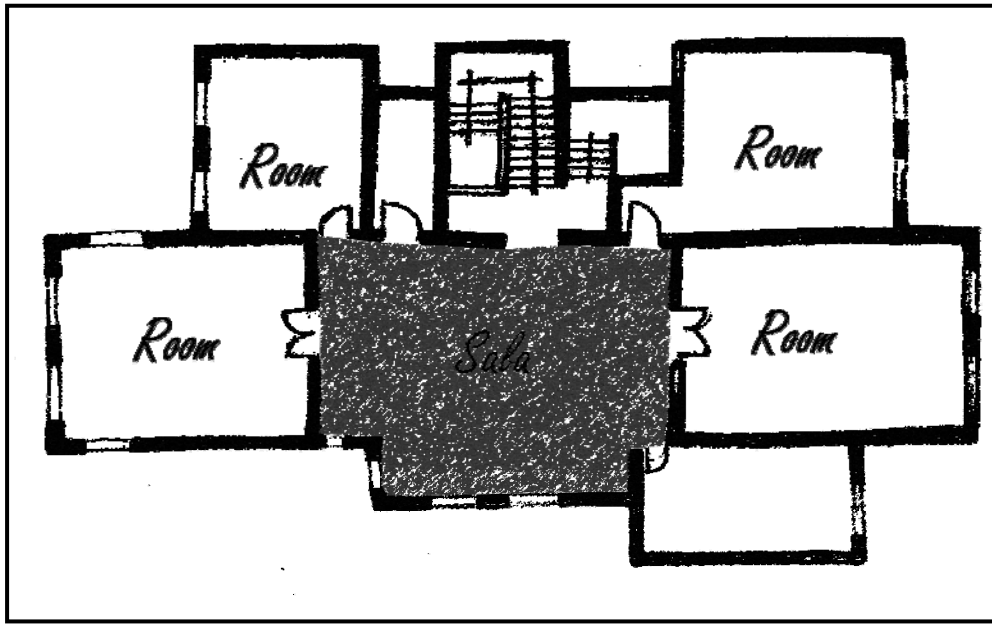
13 Floor plan for a house in Istanbul-showing the concept of central hall surrounded by rooms [Eldem, 1984]
